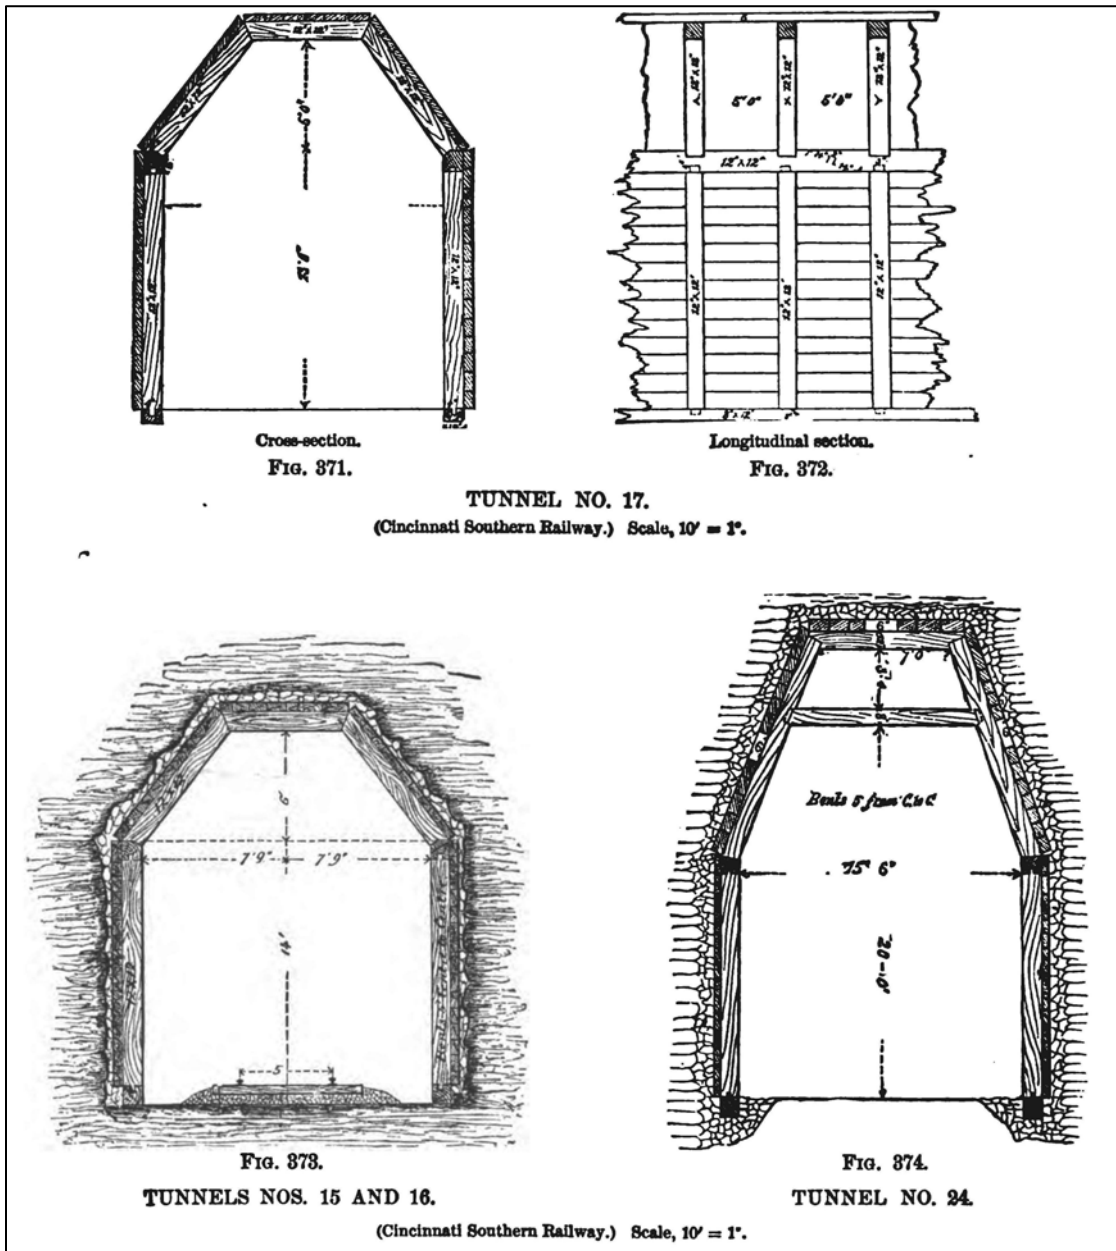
Section drawings of selected Cincinnati Southern Railway tunnels; note Sixteen Tunnel on bottom left (Drinker 1893:569).
